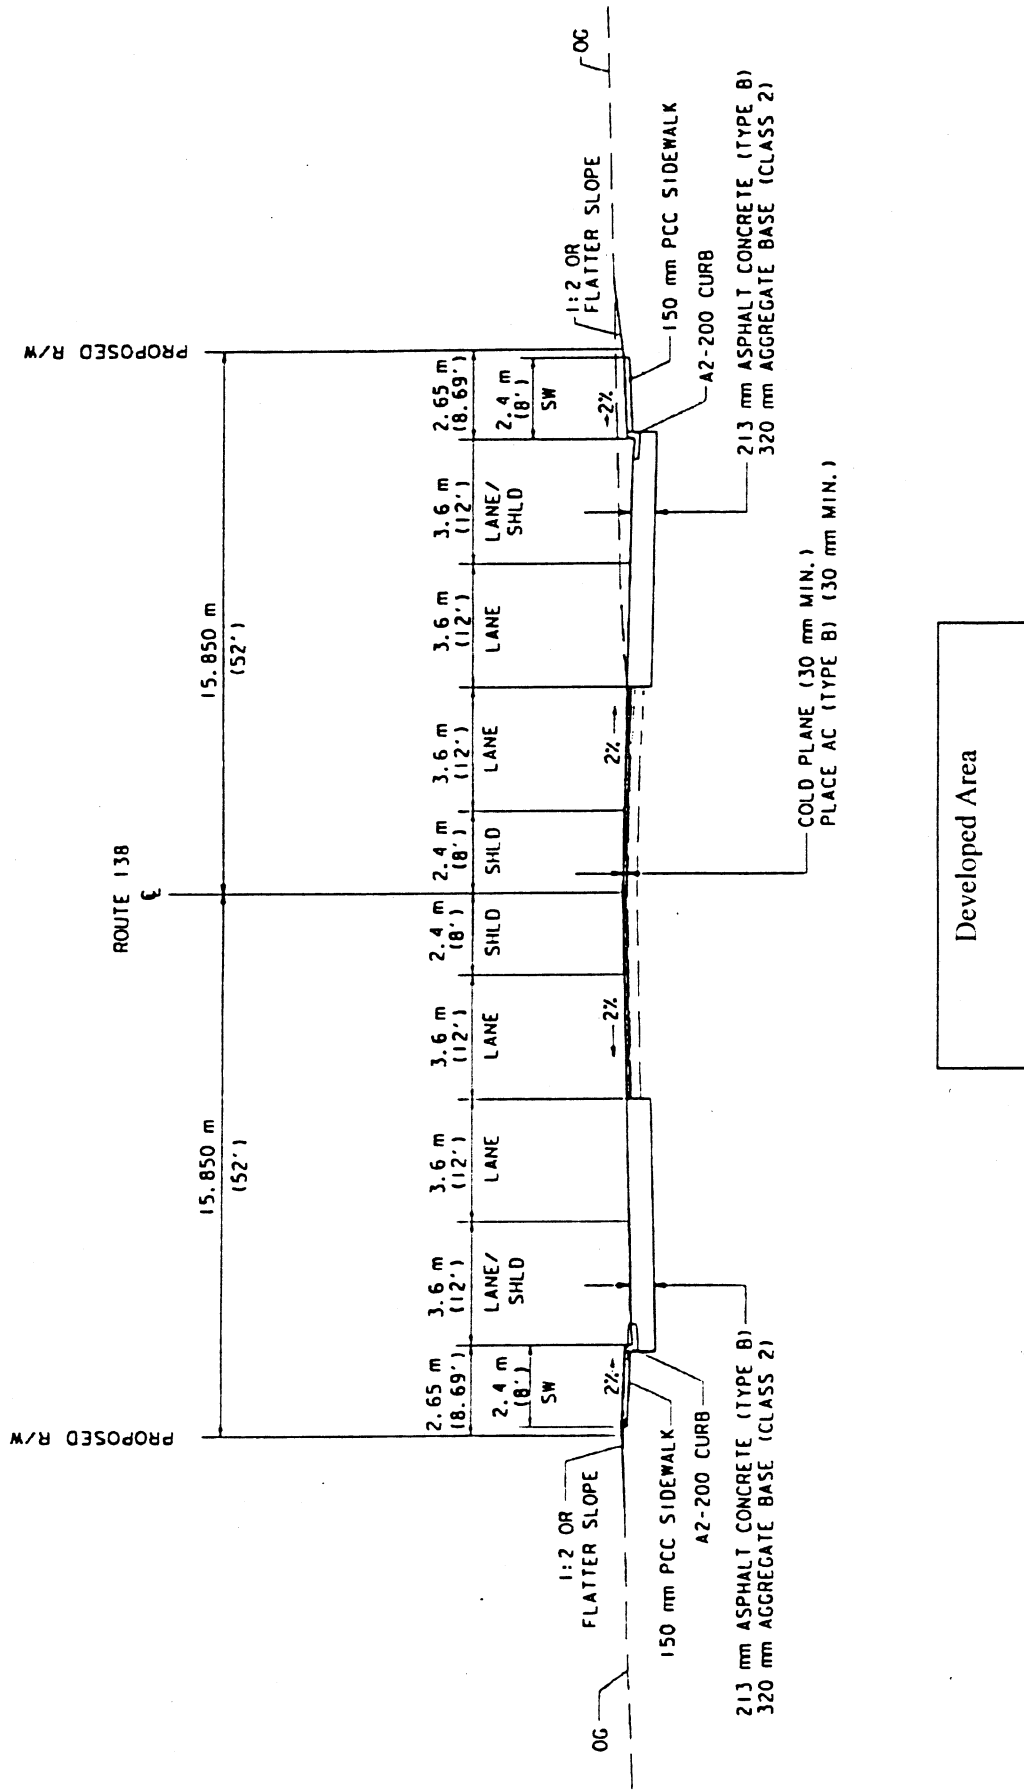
TYPICAL CROSS-SECTION FOR DEVELOPED AREA
